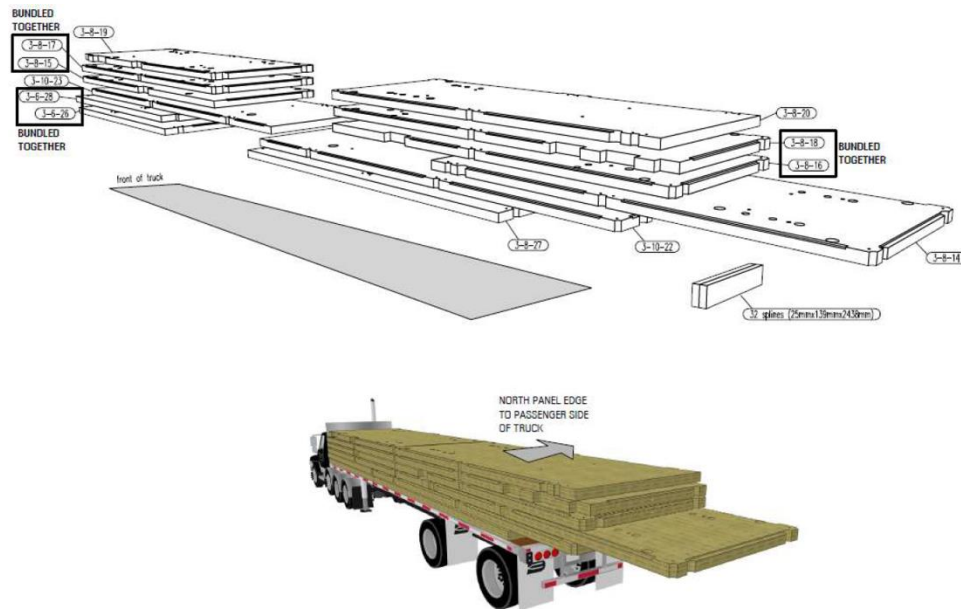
Detailed modeling of loading and unloading cycles (Fallahi, 2017)
